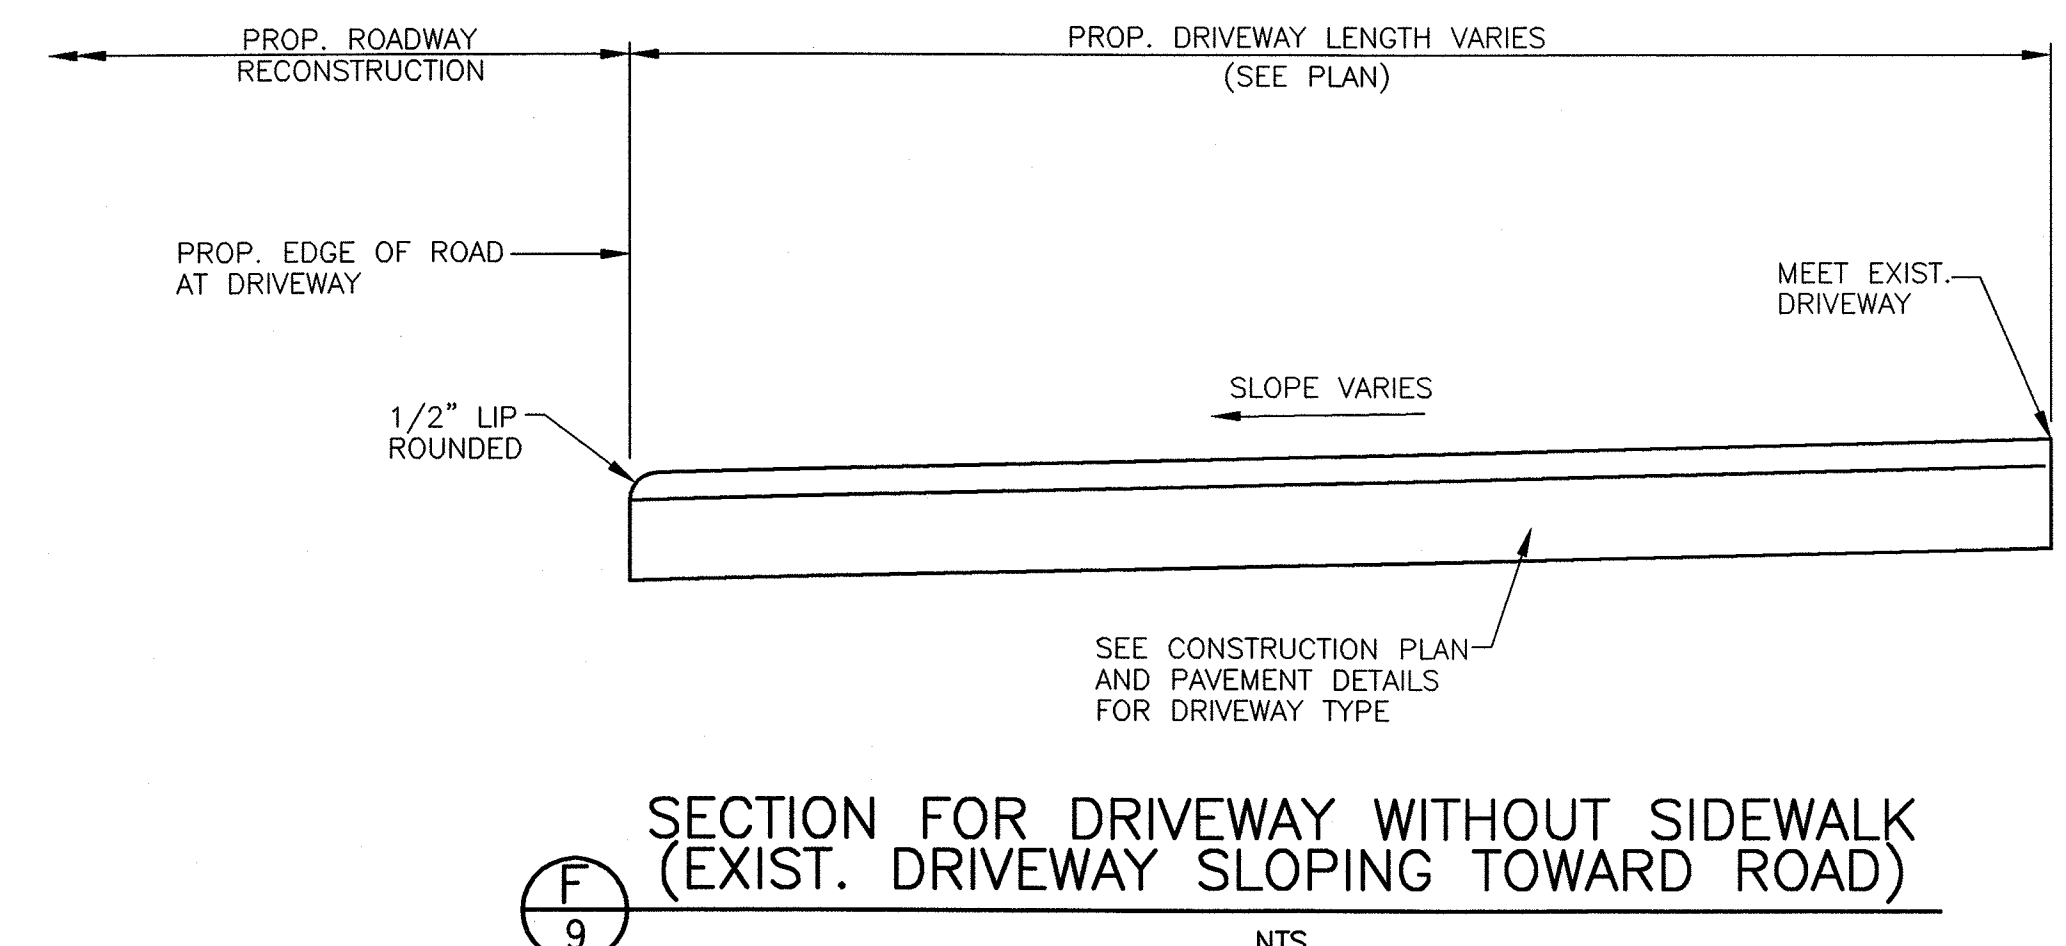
DETAIL FOR DRIVEWAY WITHOUT SIDEWALK
